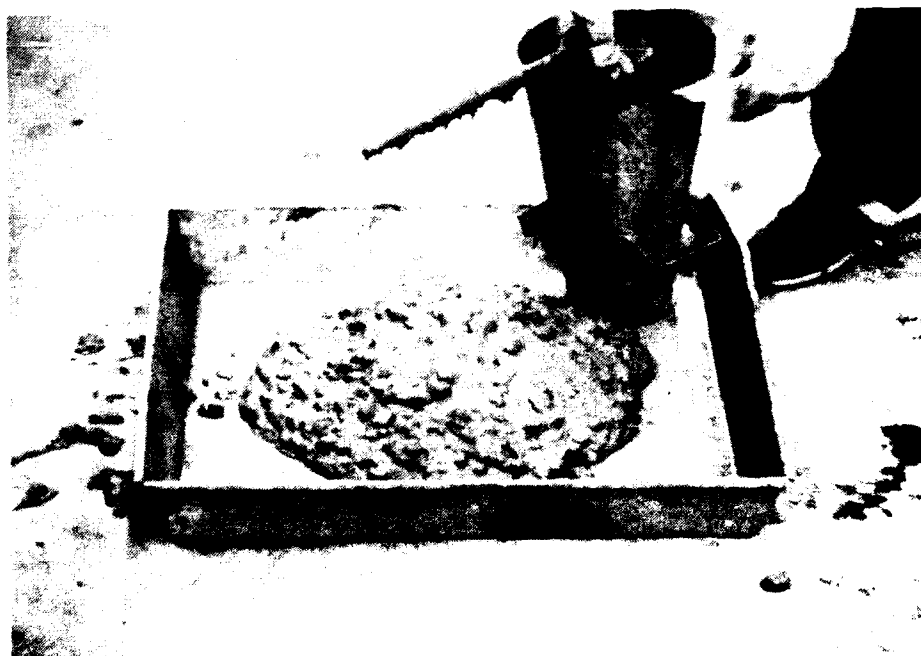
Slump of concrete 1 min after pulling cone, trial 18
